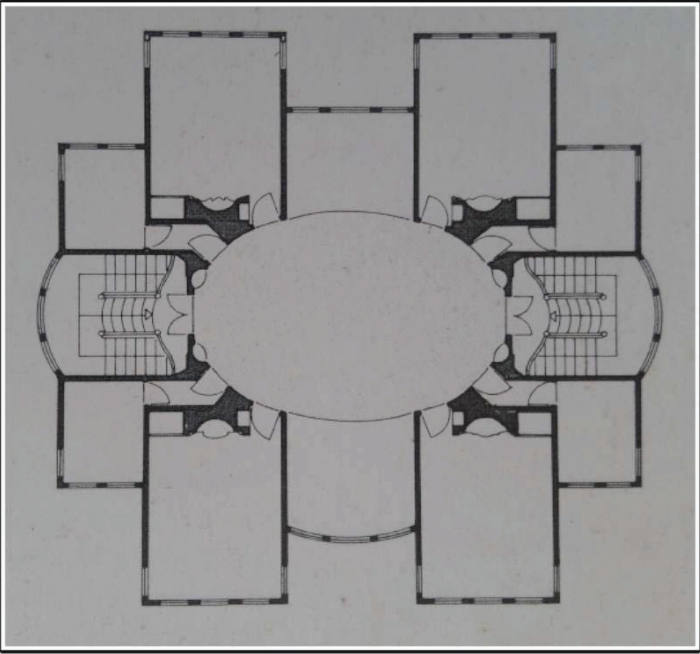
19<sup>th</sup> century house: First floor plan of Sadullah Pasha Yalısı.
